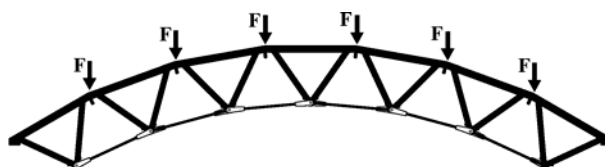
Model of the experimental full-size sample of the steel and concrete composite cable space frame subjected to the loading
